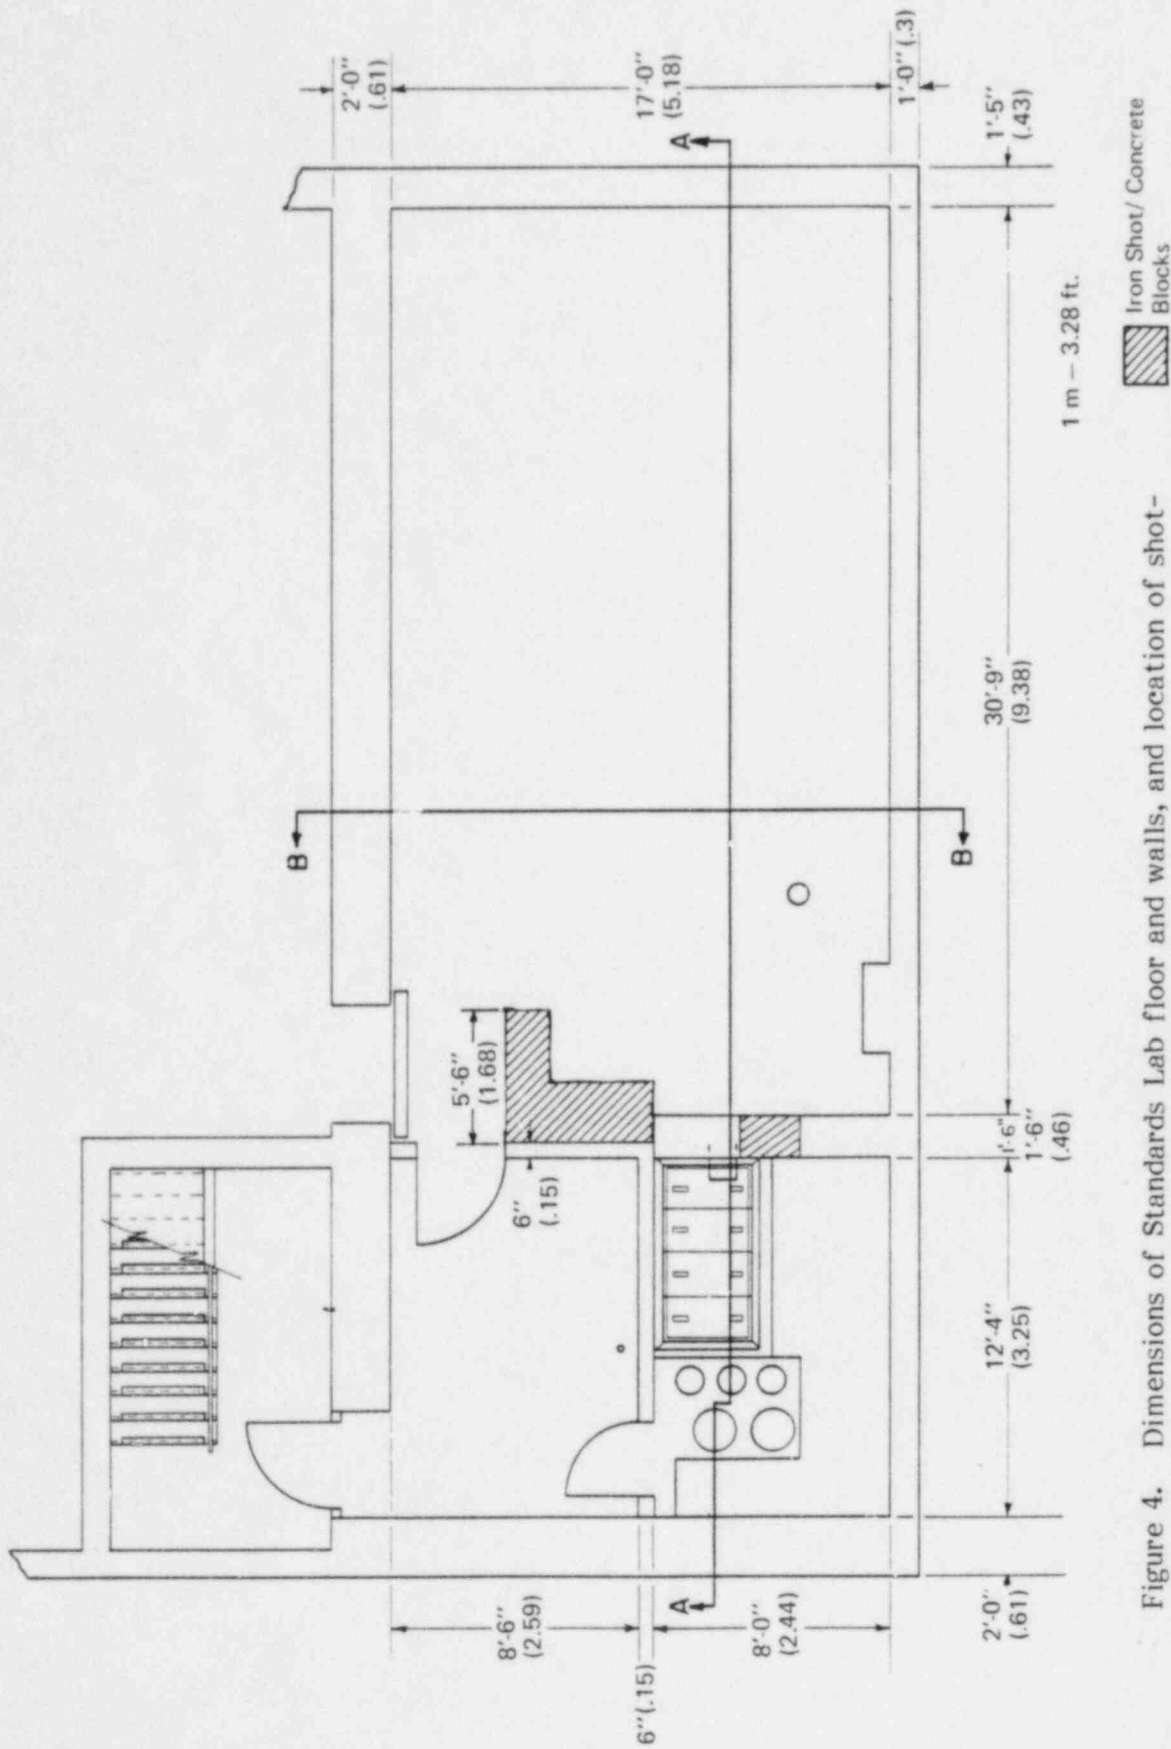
Dimensions of Standards Lab floor and walls, and location of shot-loaded block wall for additional shielding
